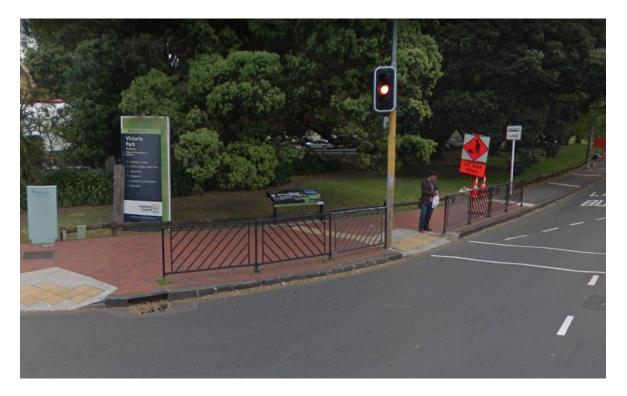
Safety barriers used to guide pedestrians to formalised crossing points on Fanshawe Street and provide separation between the footpath and adjacent traffic lane
